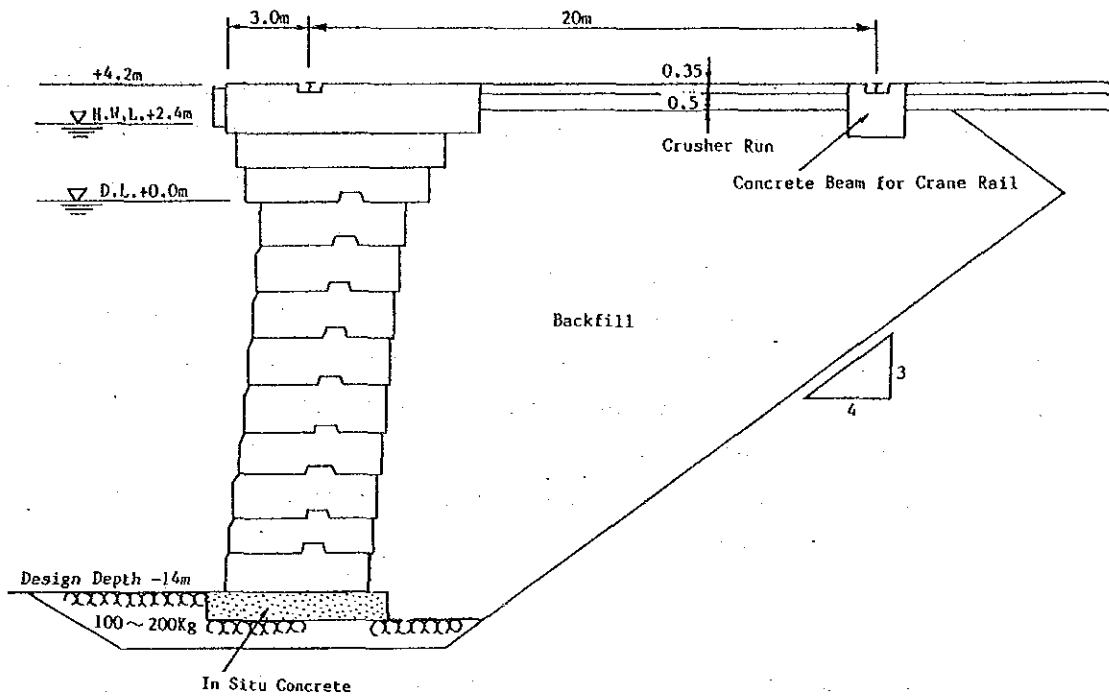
Proposed Cross Section of the Bank (-14m)
